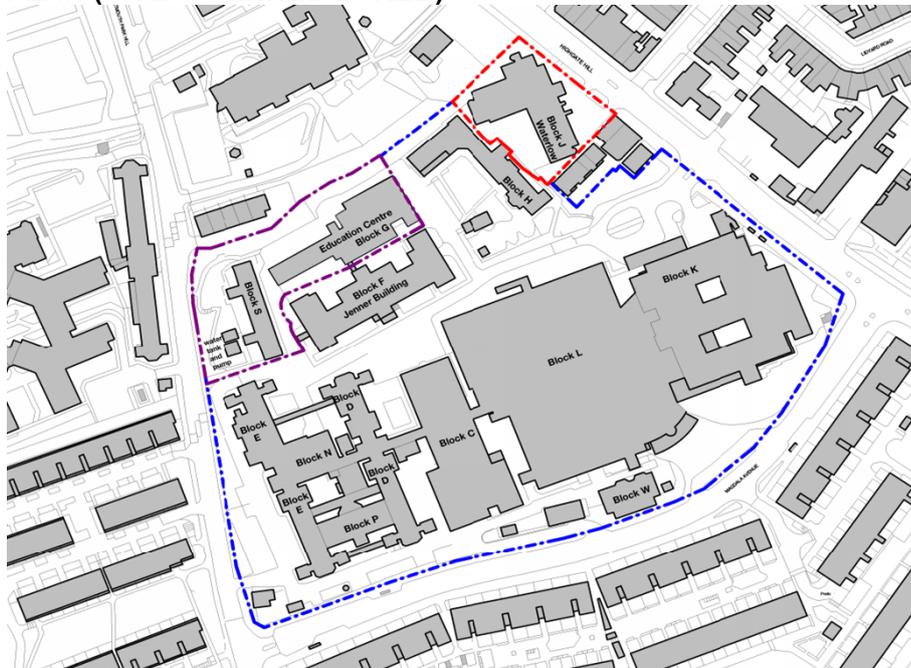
Site location plan (with the Waterlow building highlighted in red).
